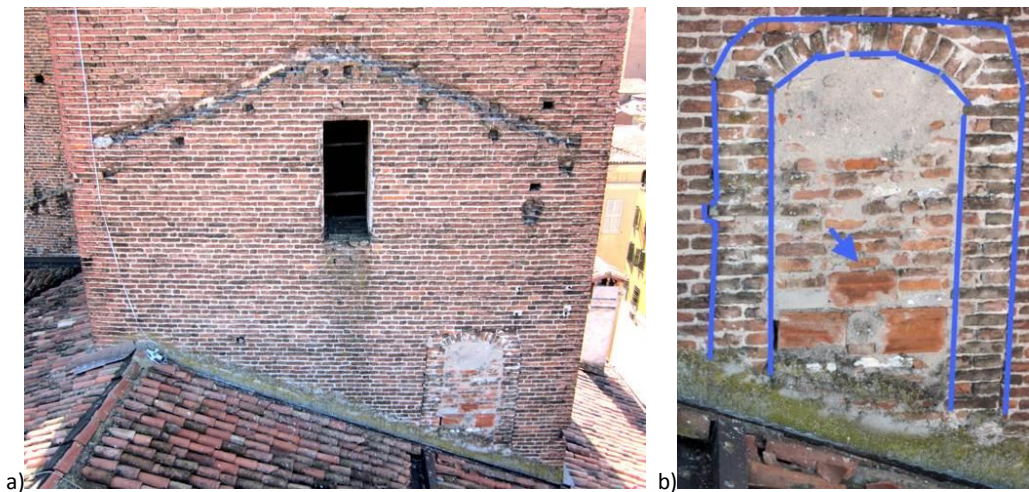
a) Detail of the wall at about 29.50 m, a roof of a building leaning against the tower, b) Details of the infilled opening, formed in a second time with respect to the construction of the tower
